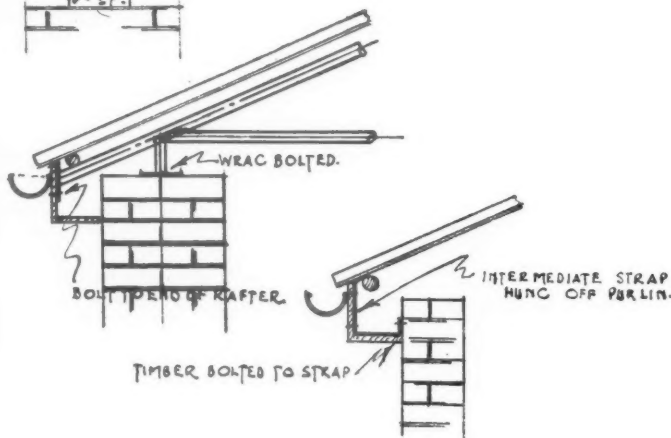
Truss wrag bolted and with gutter strap suspended from purlin.
